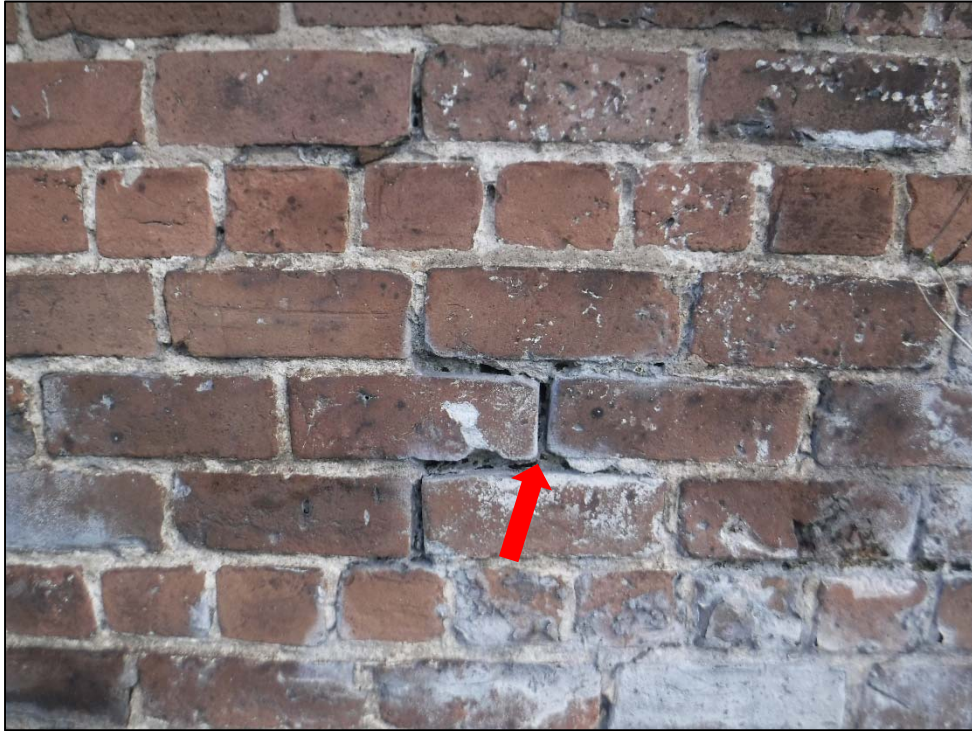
Vertical Crack with Damaged Brick in Southwest Wingwall
